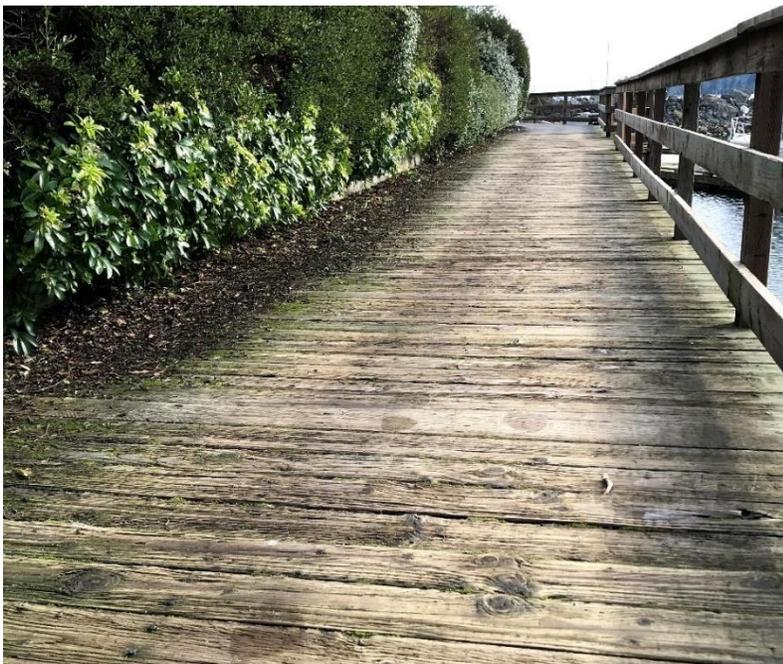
Section 7: Bushes overhanging deck, fallen organic matter is contributing to accelerated decay of the deck boards
